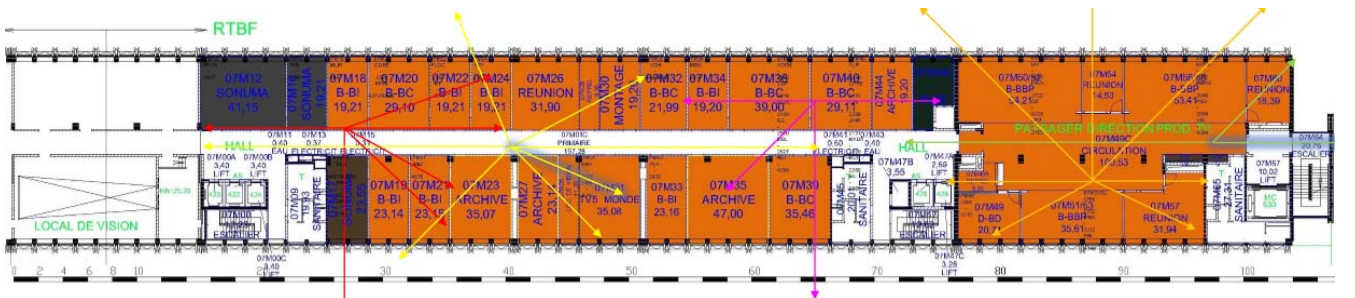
Design at 2.4 GHz for Floor 7 in Building CHJM
